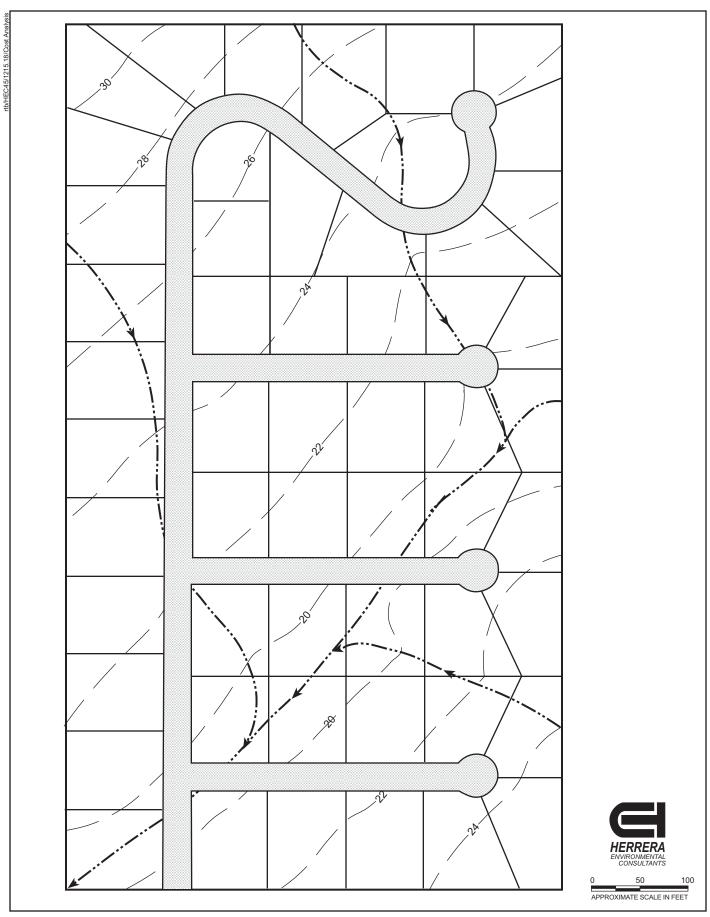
Ten-acre residential development plan, without stormwater facilities, superimposed on natural (pre-development) topography and drainage features.
